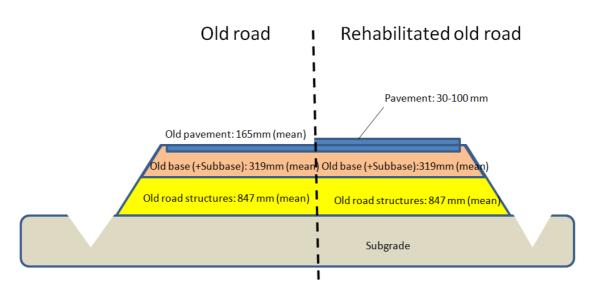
Strengthening structure for risk class section 1-4 in road section 515.
